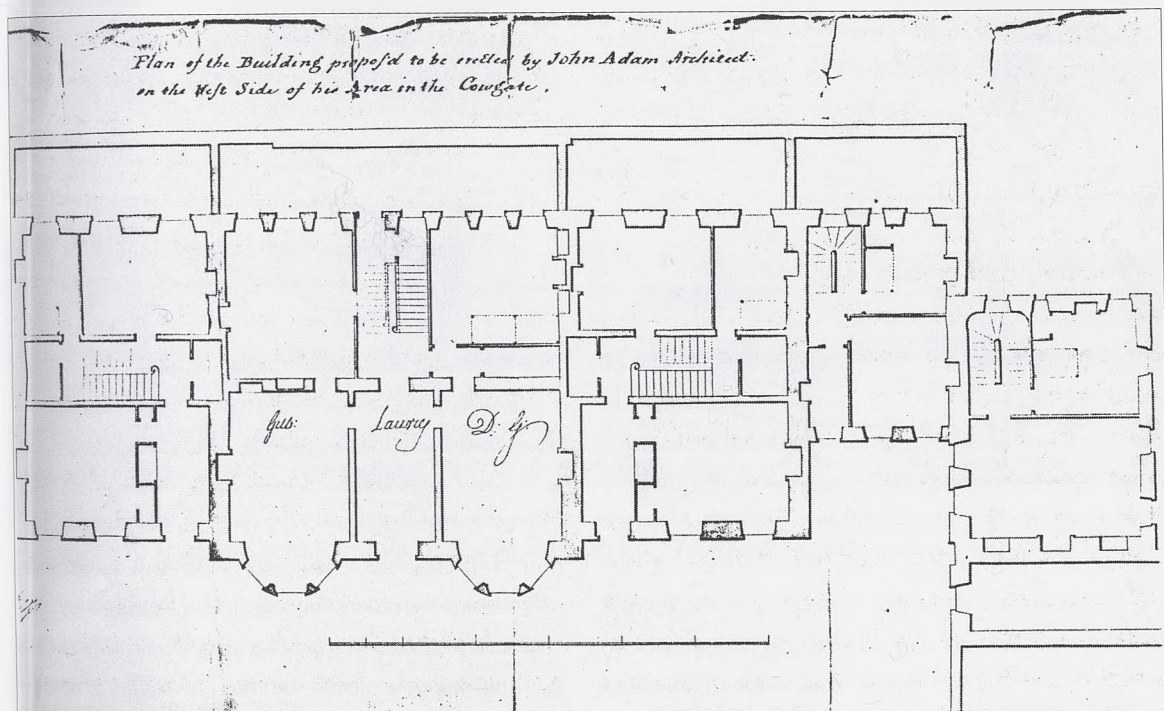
Adam Square: ground floor plan of revised design of July 1761 (unfortunately, the original plan, which was seen and copied in the 1970s, has been mislaid). (Edinburgh City Archives.)
